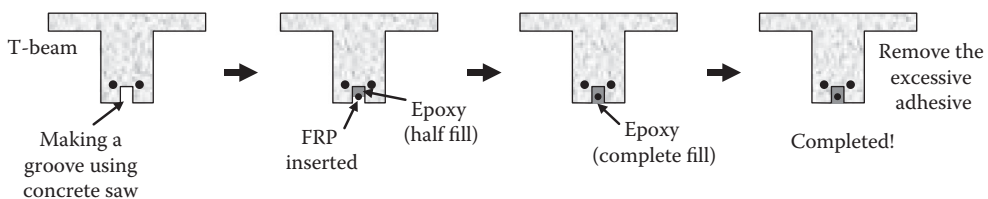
Installation procedure of non-prestressed NSM-strengthened beams.
